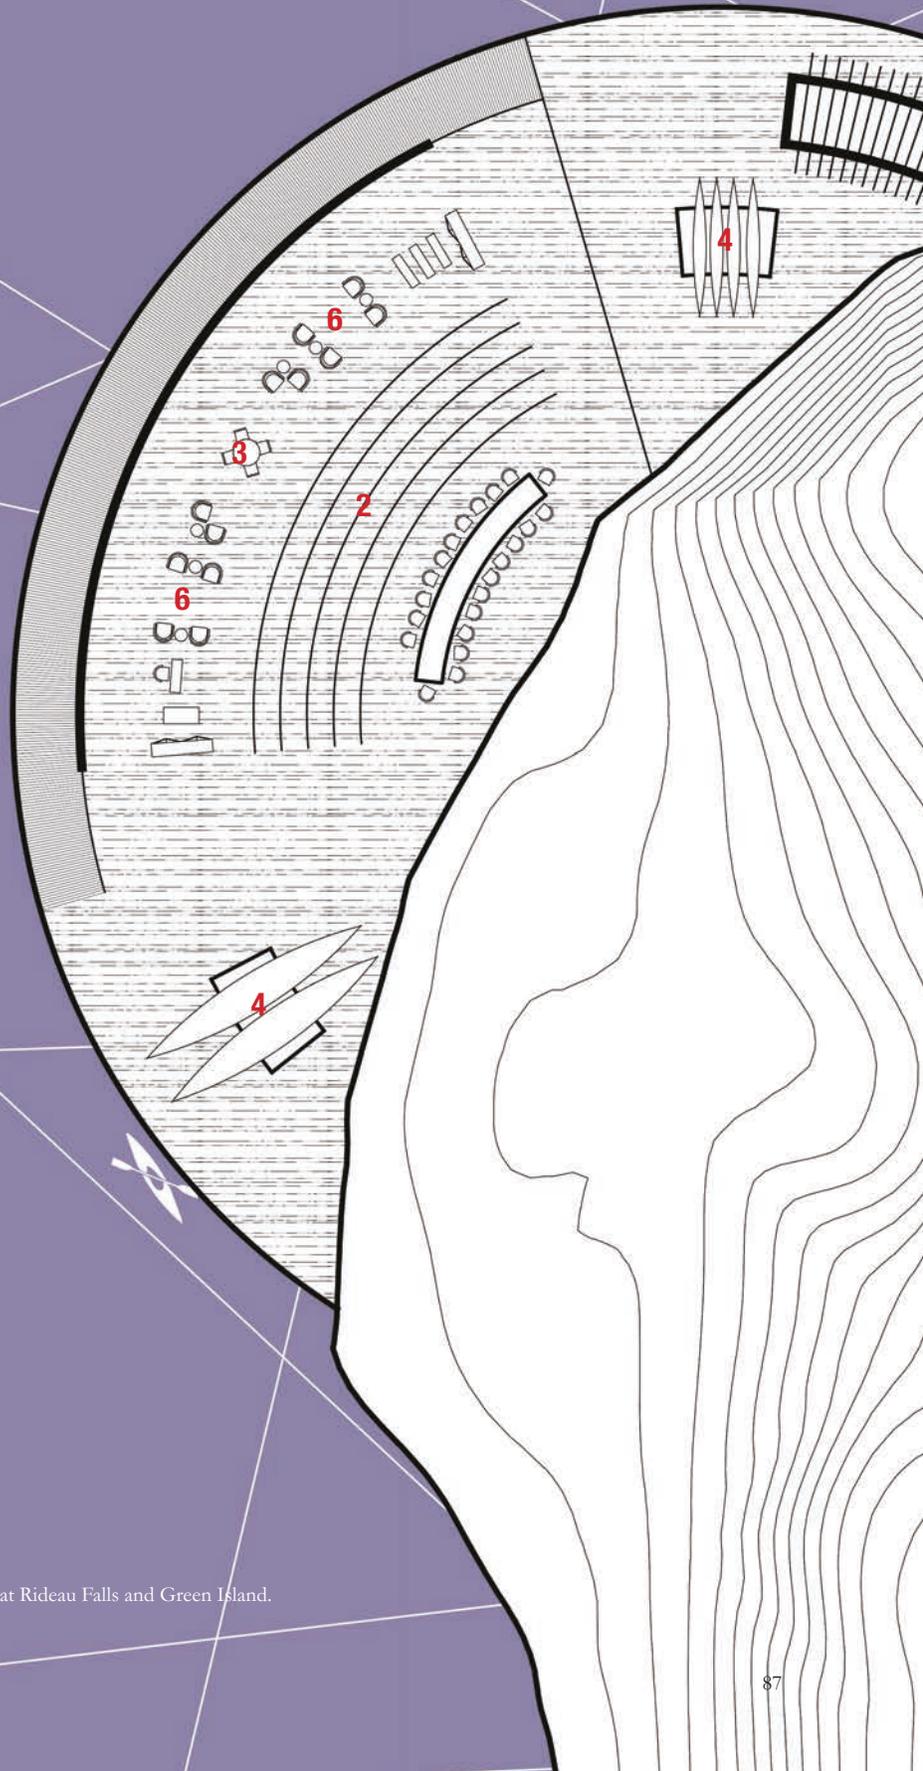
| Plan of the northern pavilion moored to the dock at Rideau Falls and Green Island.
